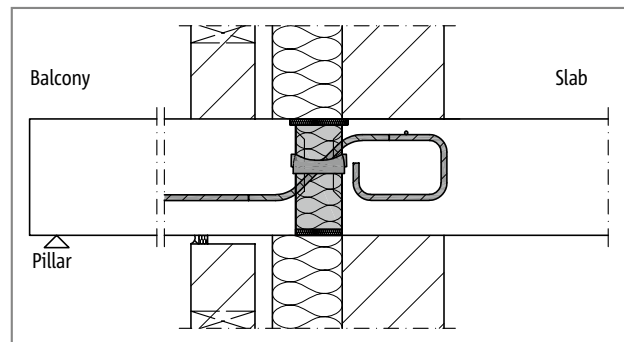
Schöck Isokorb® T type Q-E-W-V: Connection for core insulation
